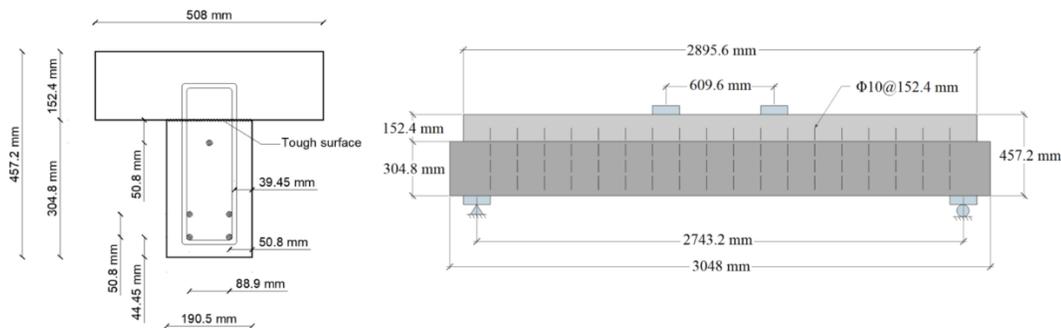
Schematic and cross-section of the pre-tensioned prestressed concrete beam.
